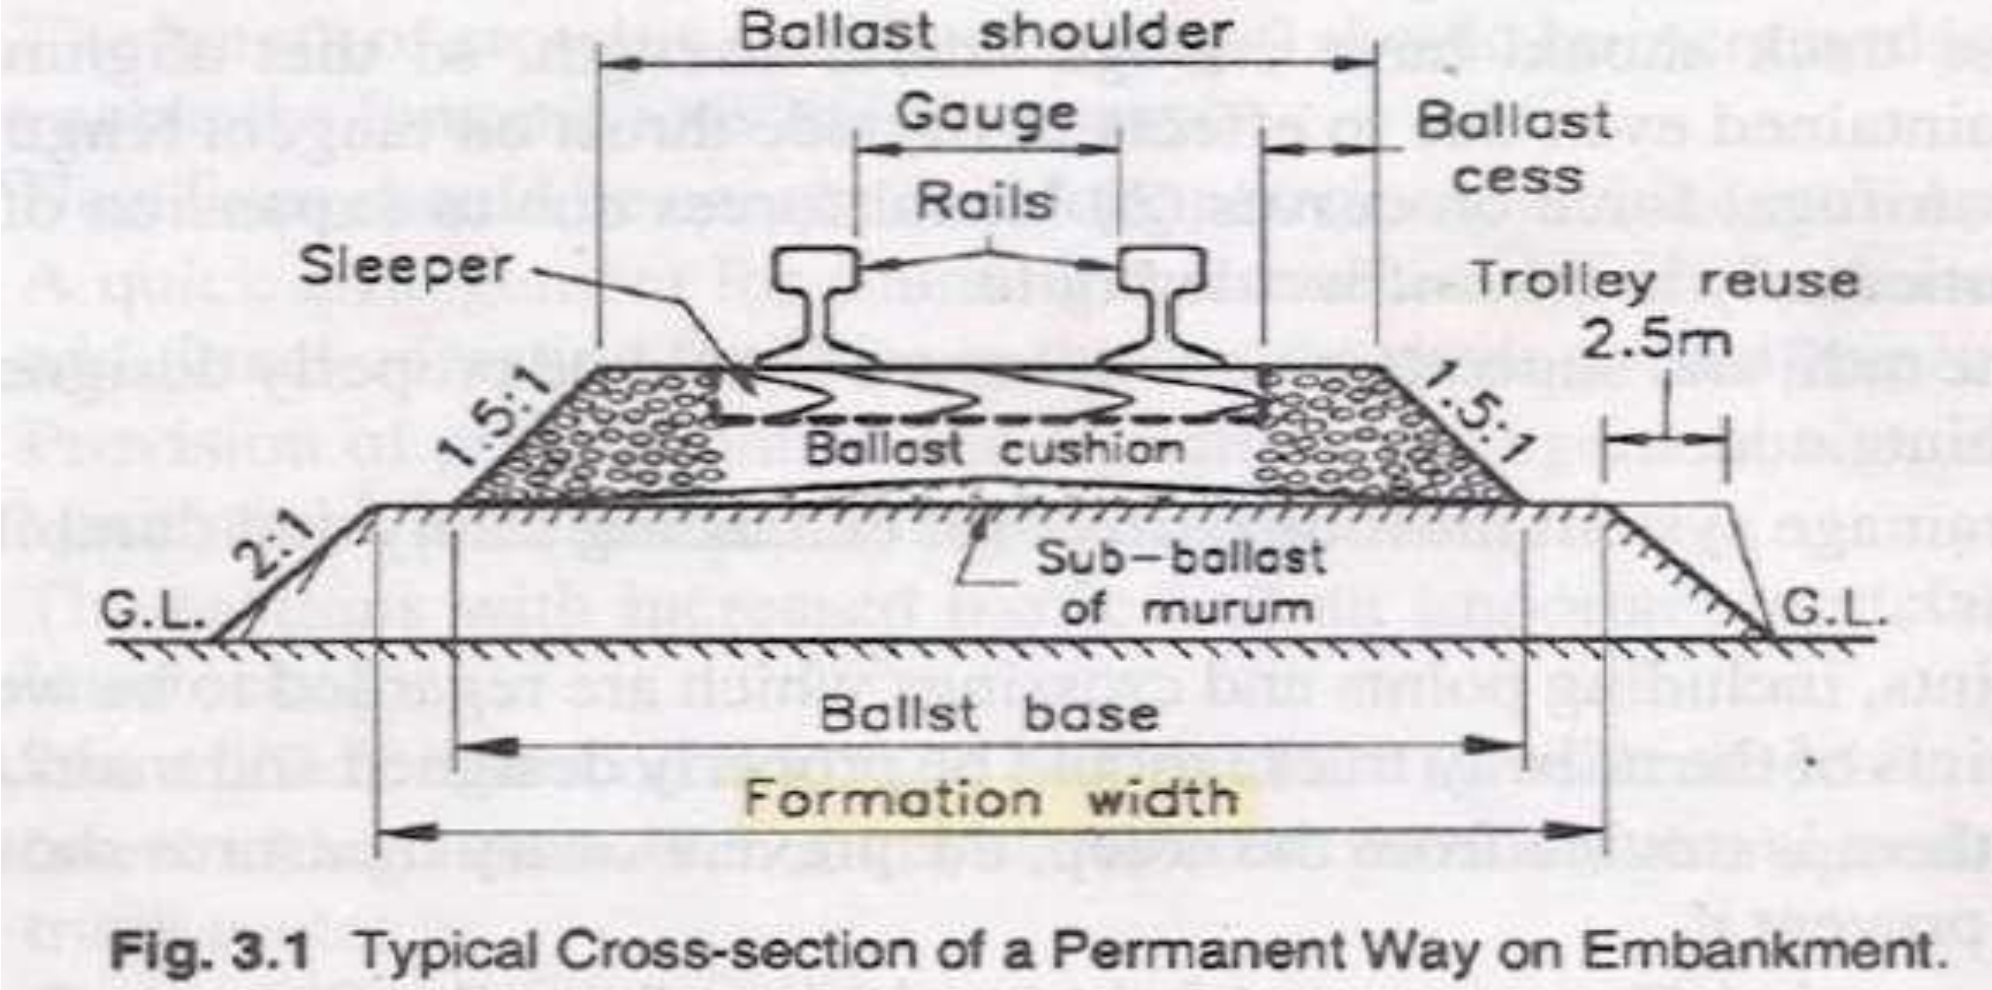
Typical Cross-section of a Permanent Way on Embankment.
